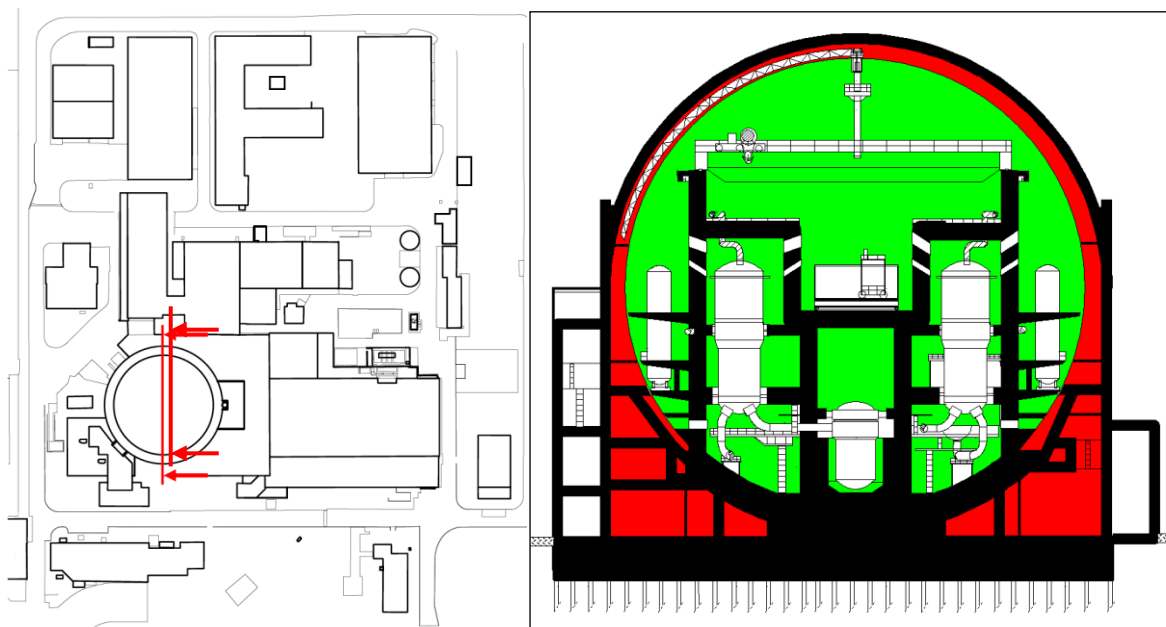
Location and cross-section of building 01 (green) and 02 (red).
